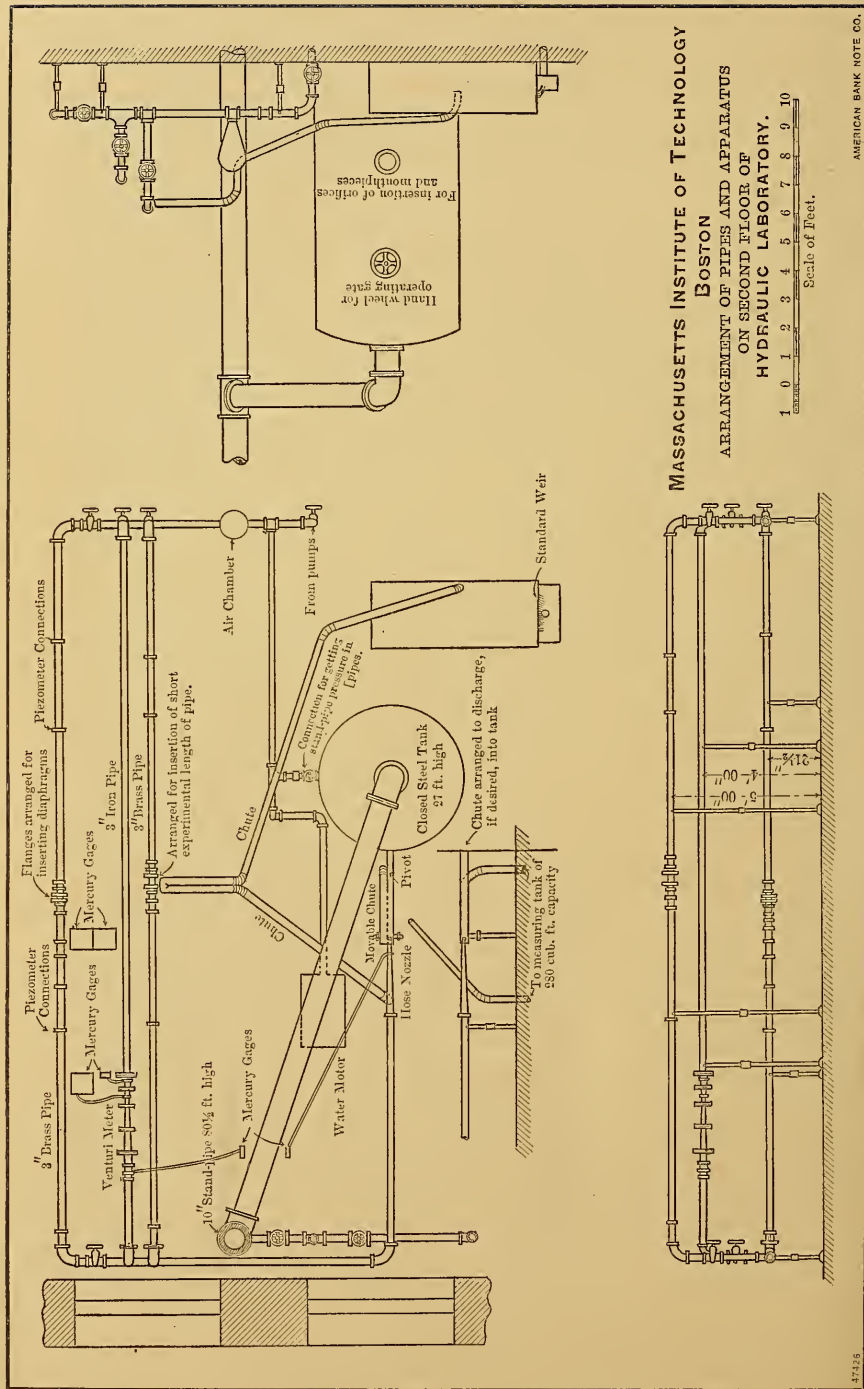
Pipes and Apparatus on Second Floor of Hydraulic Laboratory.
